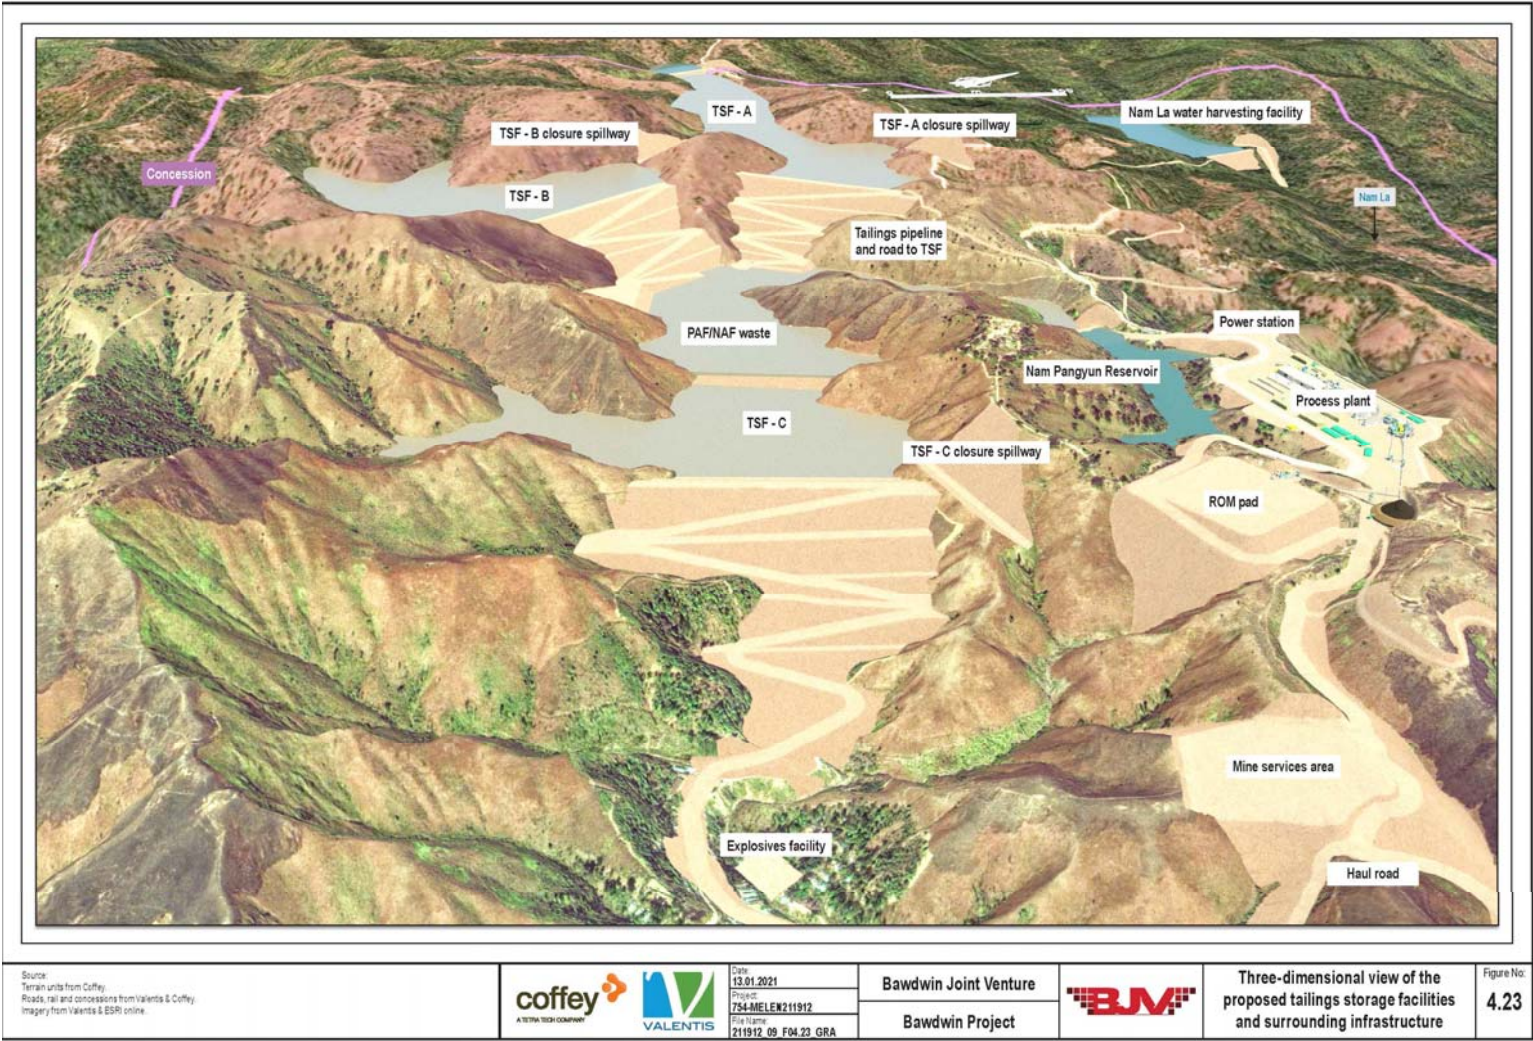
Three-dimensional view of the proposed tailings storage facilities and surrounding infrastructure
